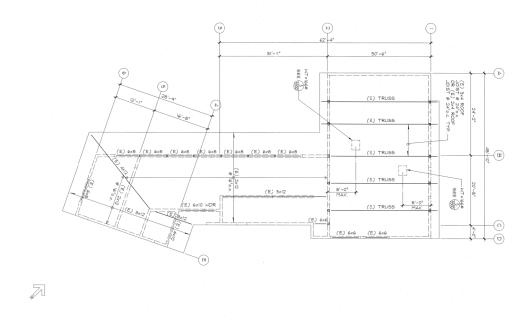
BUILDING 1: 2017 HVAC Upgrade Roof Framing Plan
